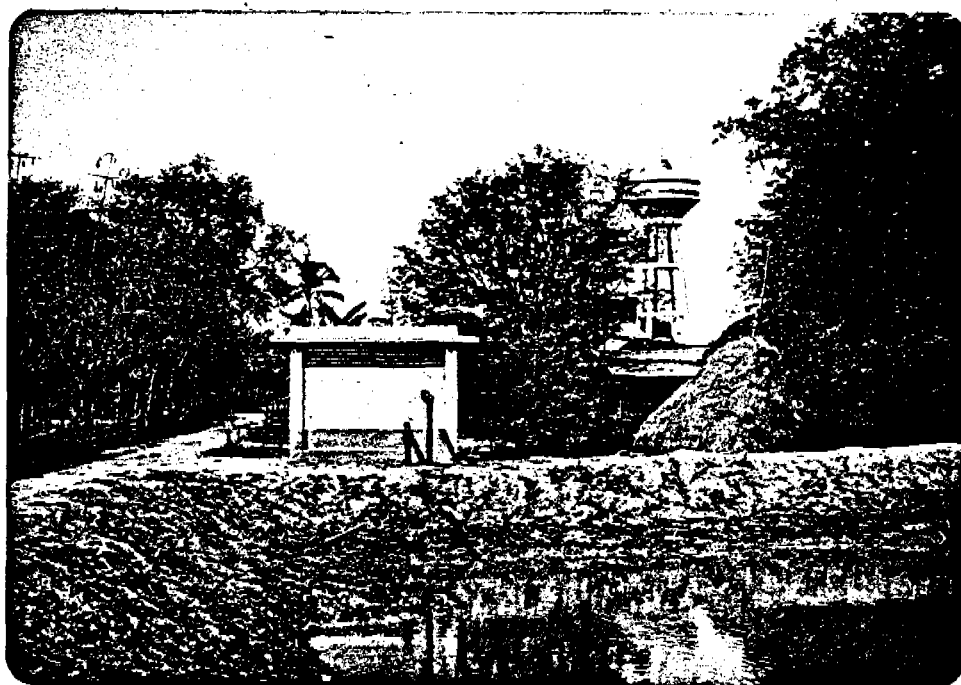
Showing a holding pond, a pump house and an elevated tank at Ban Bangloa, Singhburi Province.
